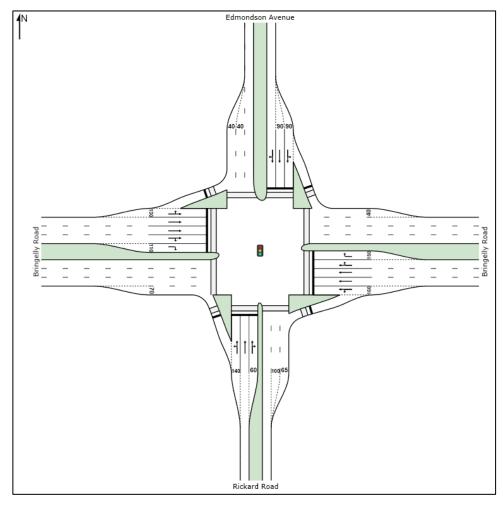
Future Layout of Bringelly Road with Edmondson Avenue and Rickard Road (SIDRA)
